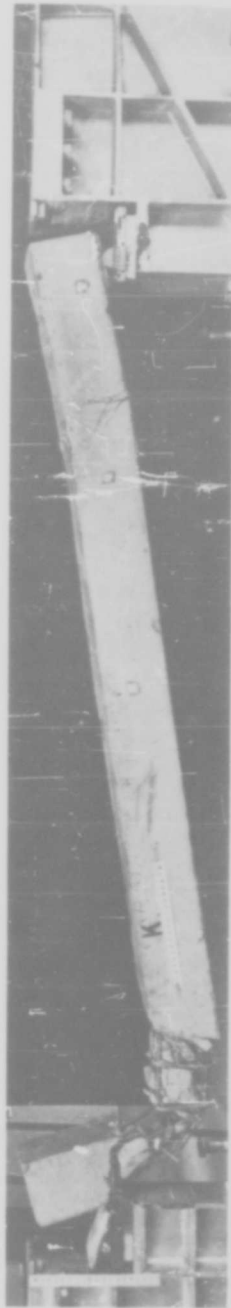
Beam K after a static load of 268 lb/linear inch.
